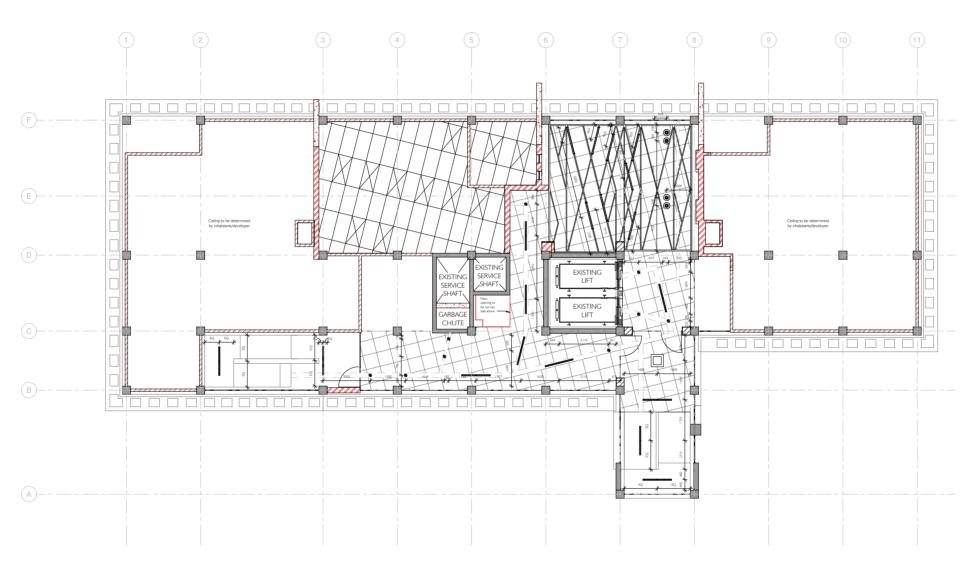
Third floor ceiling and lighting layout (by Author, not to scale)
